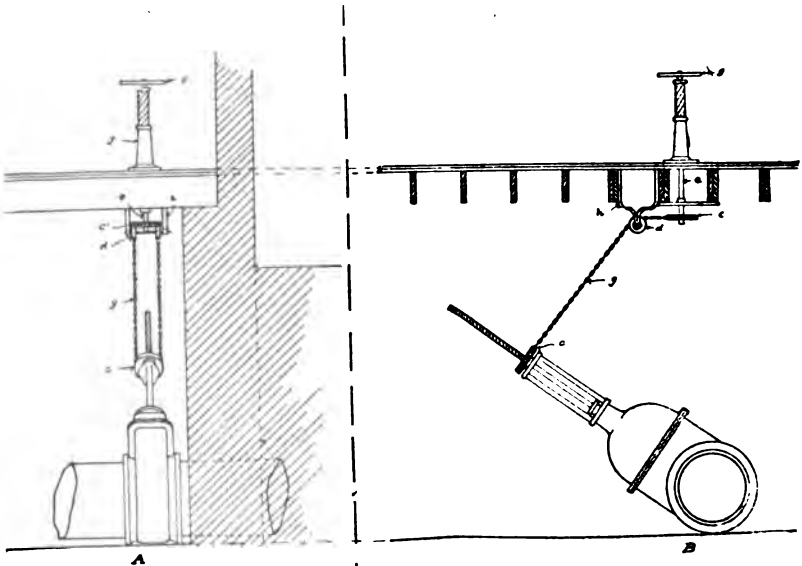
FIG. I. CHAIN GEAR CONNECTION TO INACCESSIBLE VALVE.
